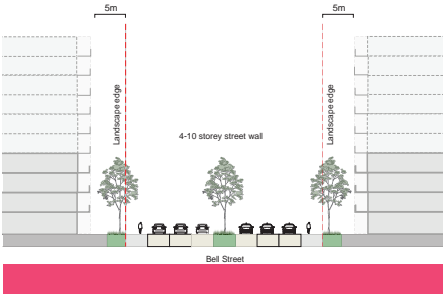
Bell Street, Bell Street Precinct. A 5m ground floor setback is proposed to manage amenity on this major road.
